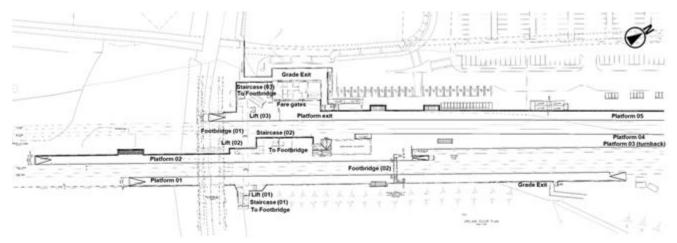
Hazelhatch & Celbridge Station. General plan.
